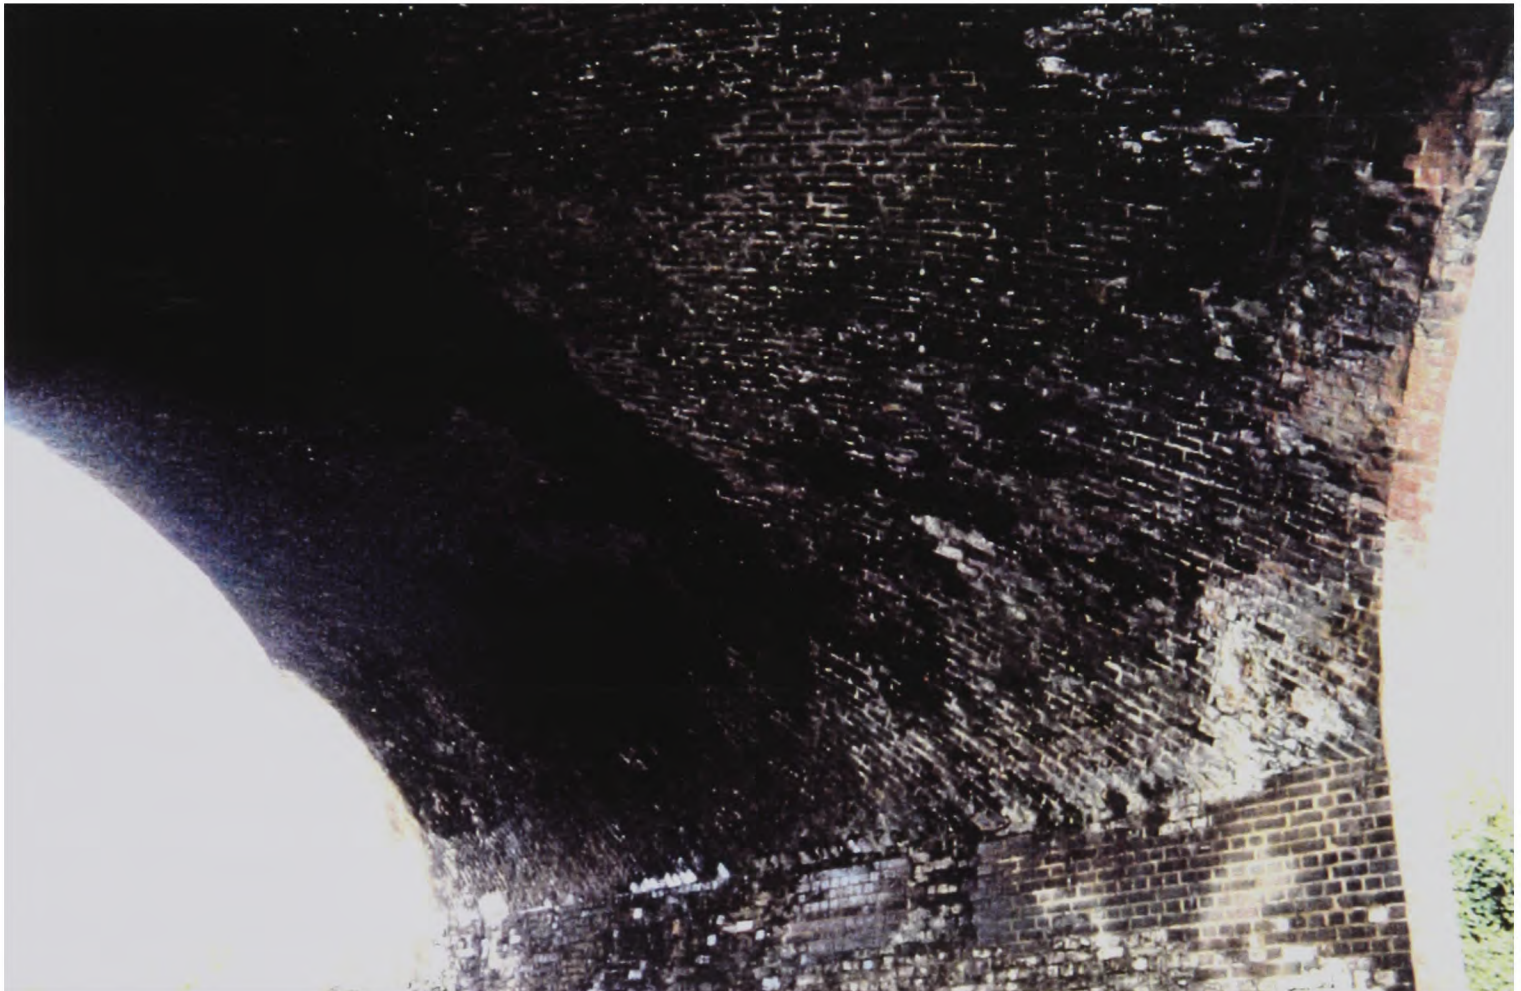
Edge detail adopted on highly skewed arch bridges
